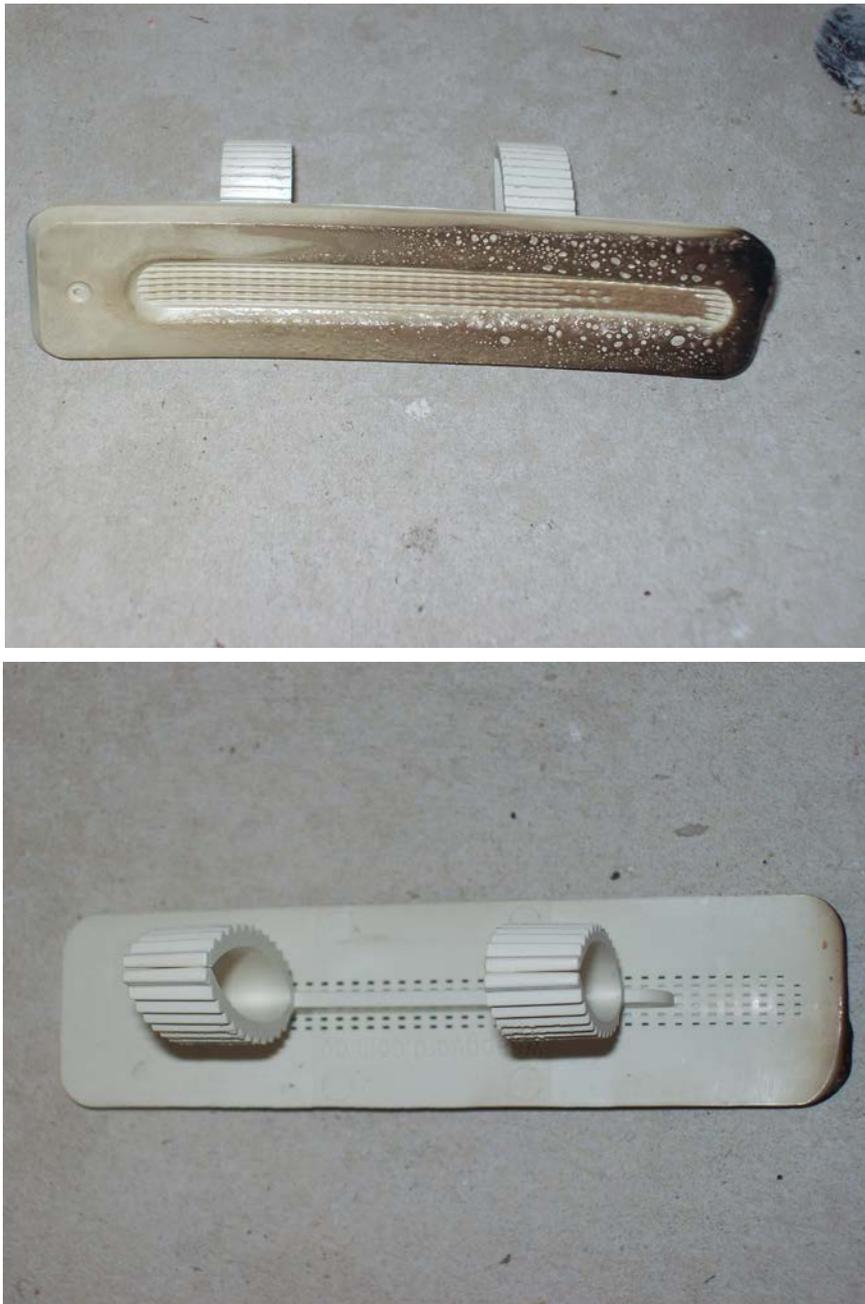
Post test inspection of Weepguard weephole barrier removed from wall structure.
